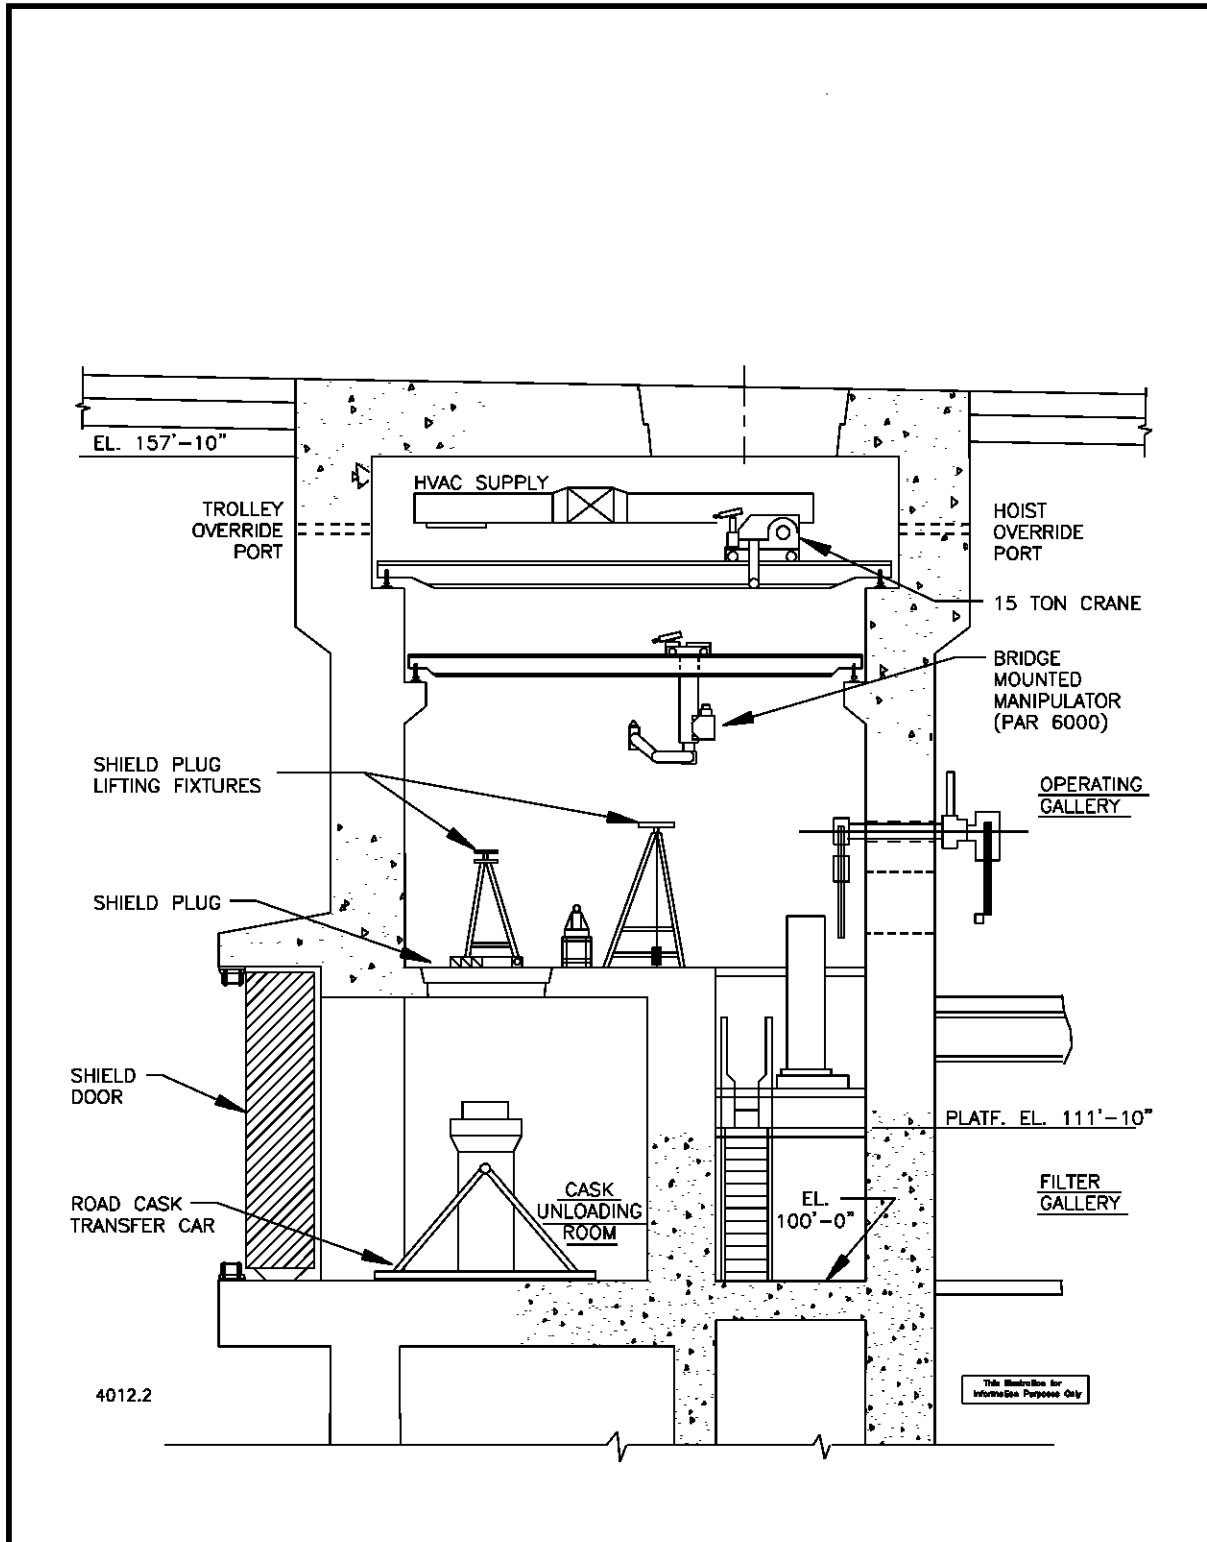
Details of Hot Cell at Cross Section E-E
